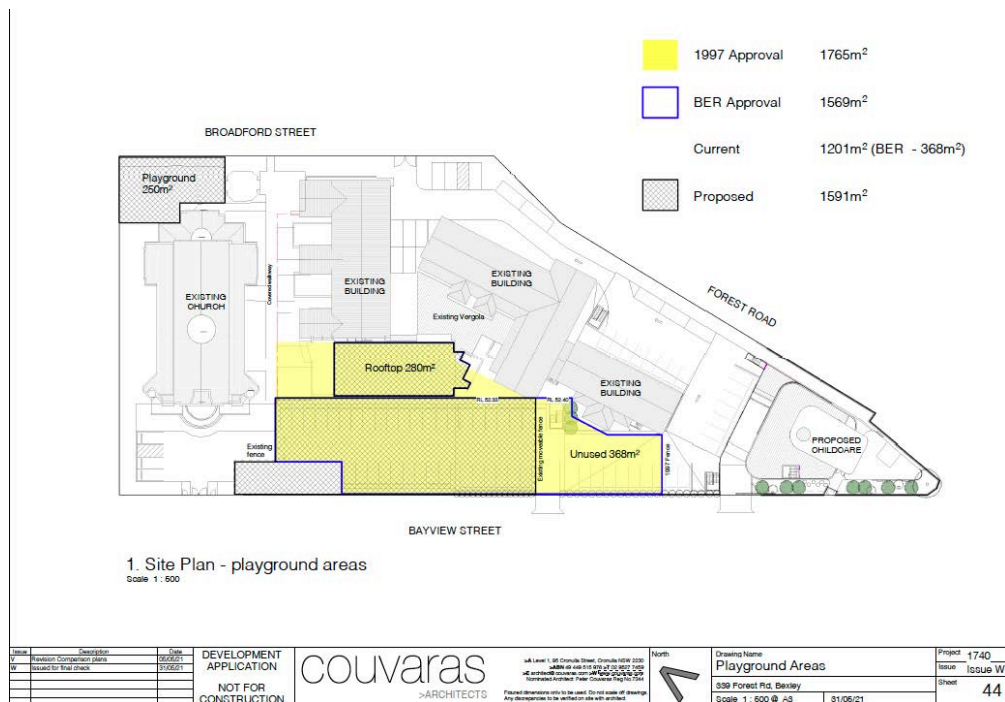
Approved and Existing Playground Areas Compilation Plan
